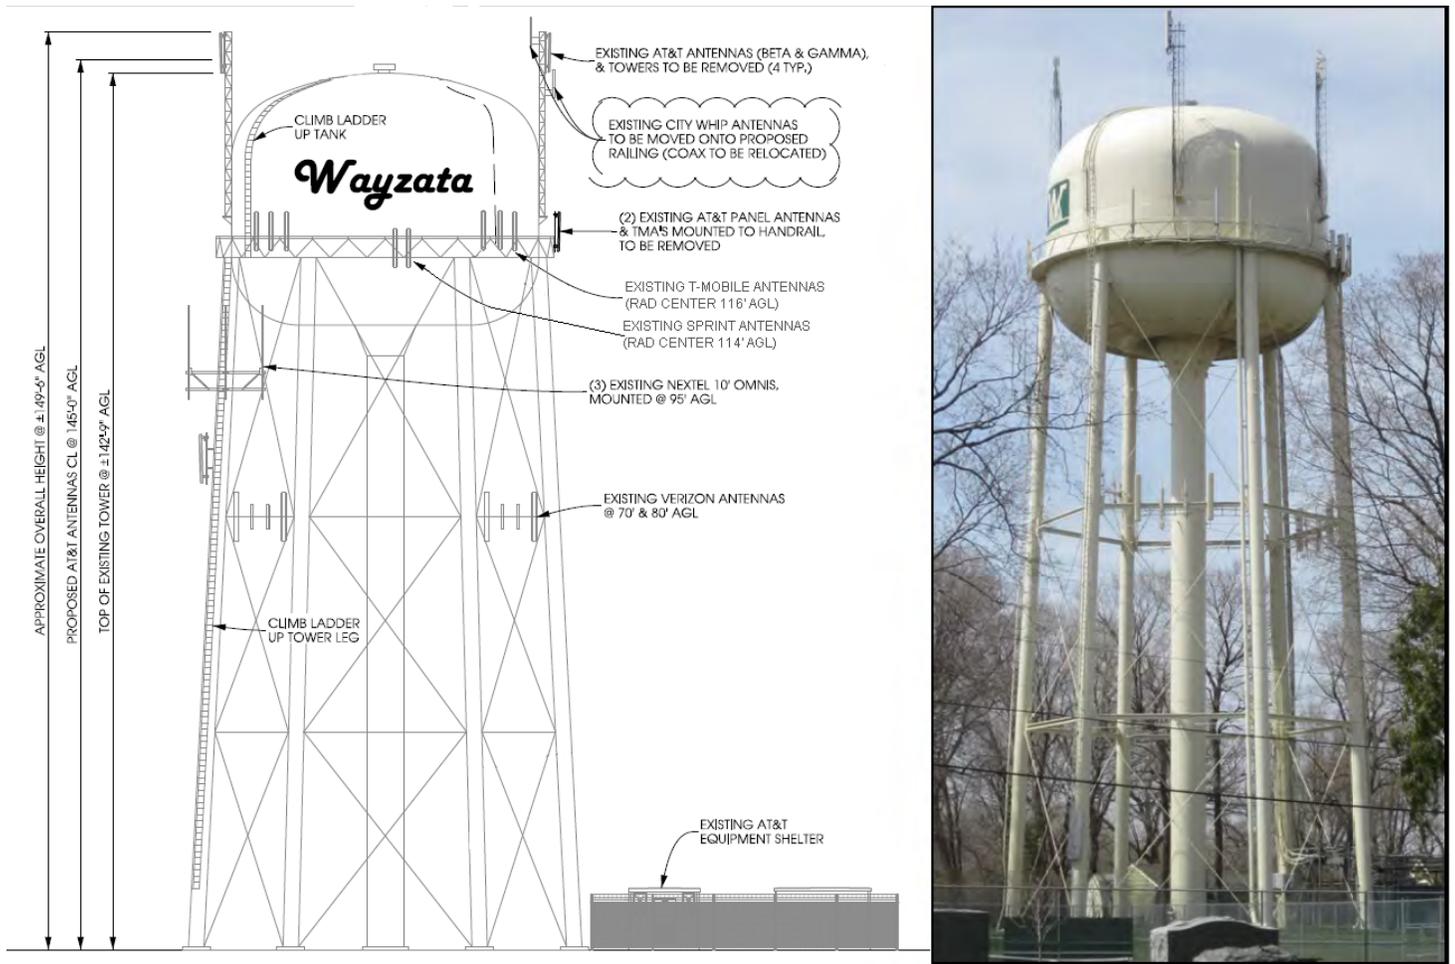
represents a typical site elevation diagram that is included in the site plans provided by carriers as part of the site application and lease process, or during site improvements or replacements. This diagram is from a recent AT&T plan set.
